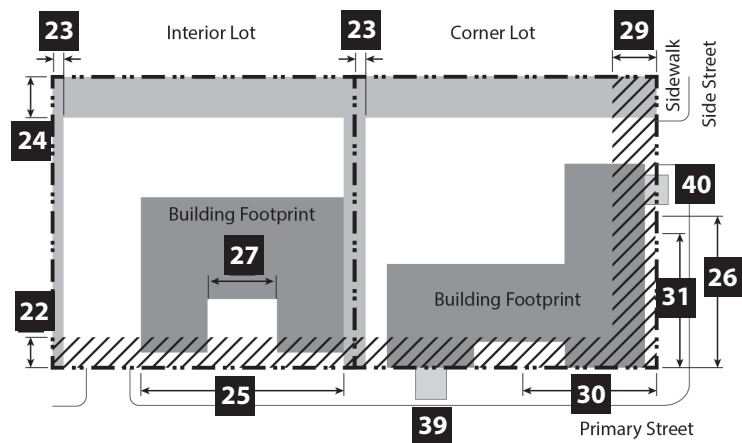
Building placement example diagram. Not to scale.
